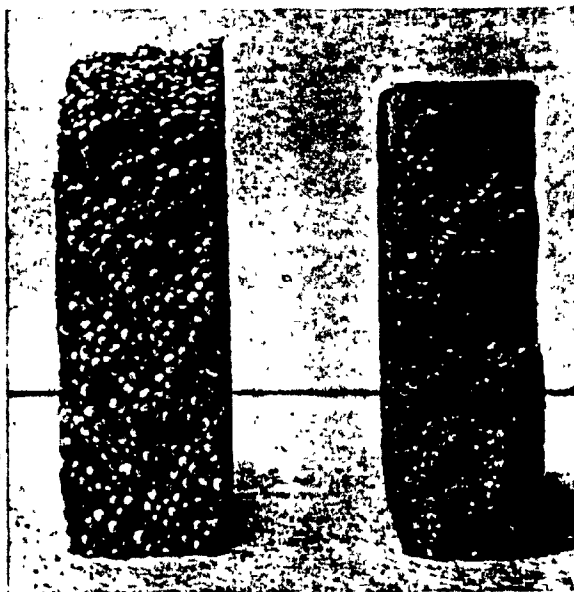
Break surfaces of Sparfil Concrete specimens with (right) and without (left) bonding additive
